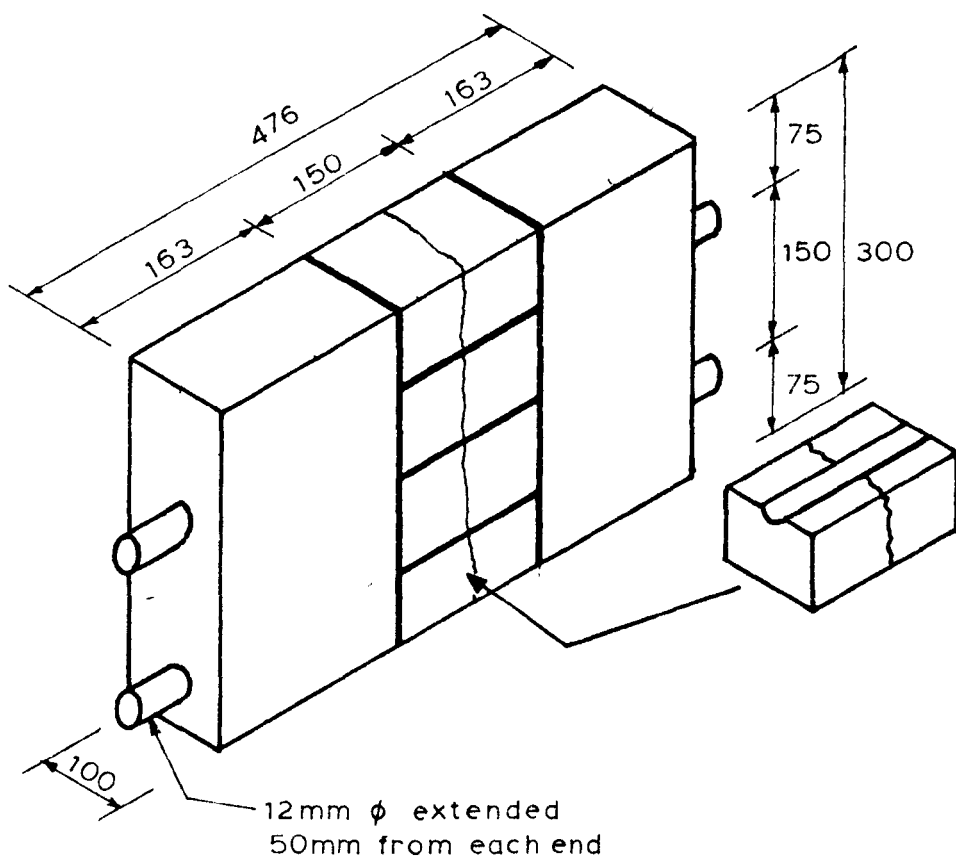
METHOD OF CUTTING SPECIMEN TO ALLOW INTERNAL CRACK INSPECTION.
